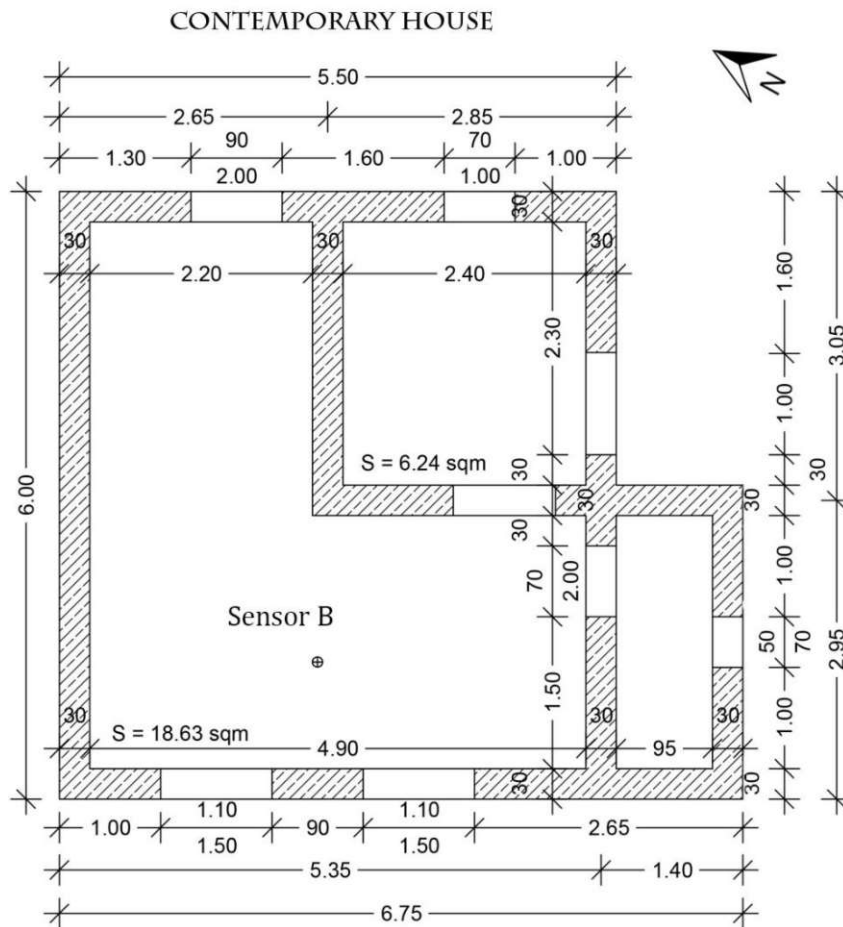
Floor plan of the analyzed contemporary house with sensor positioning
